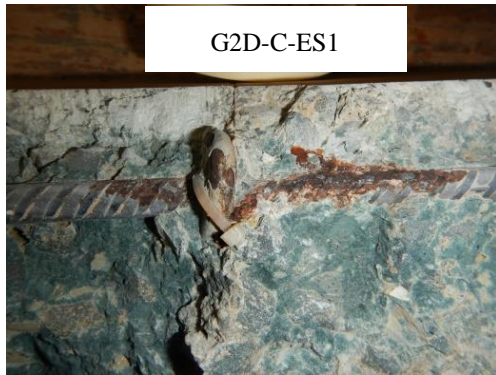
Photographs of corroded reinforcement bars in cracked PC/SL concrete.
